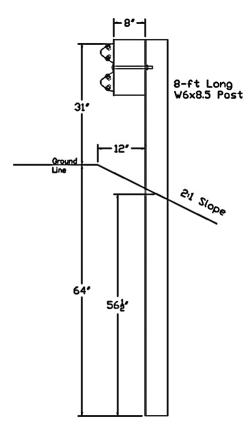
Barrier Installation, Test Nos. 405160-20-1 and 405160-20-2 [19]
